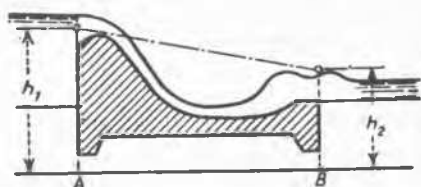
MASONRY pier subject to hydrostatic uplift.
